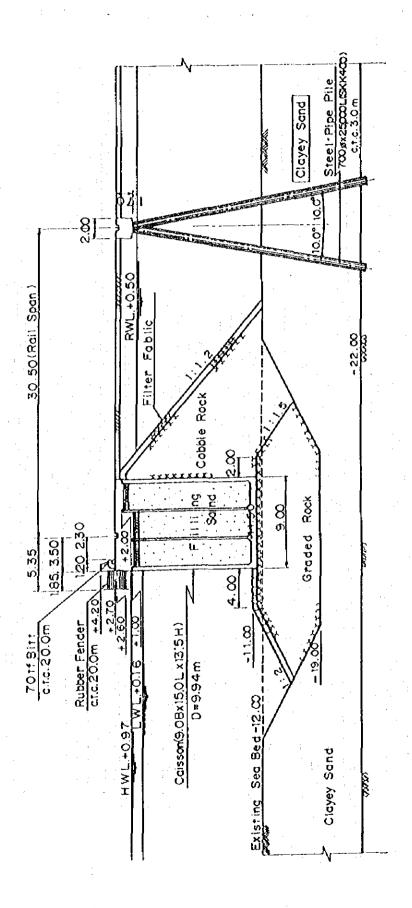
Standard Cross Section of -16.0 m Quaywall ® (Concrete Caisson type)
